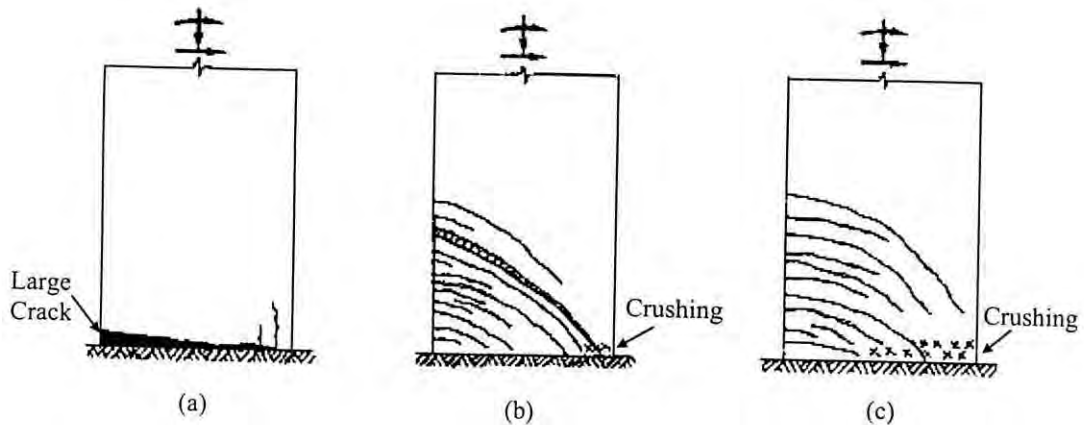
Failure Modes: High-rise Walls. (a) Fracture of Steel. (b) Flexure-Shear Failure. (c) Failure by Concrete Crushing (Ferguson, 1987).
